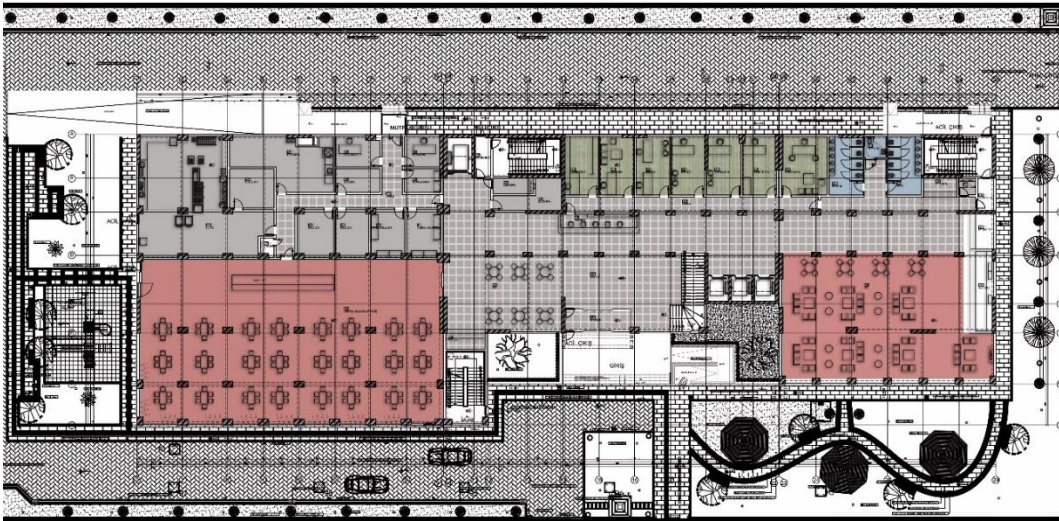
300-bed teacher's house ground floor plan, Çelik, 2017
